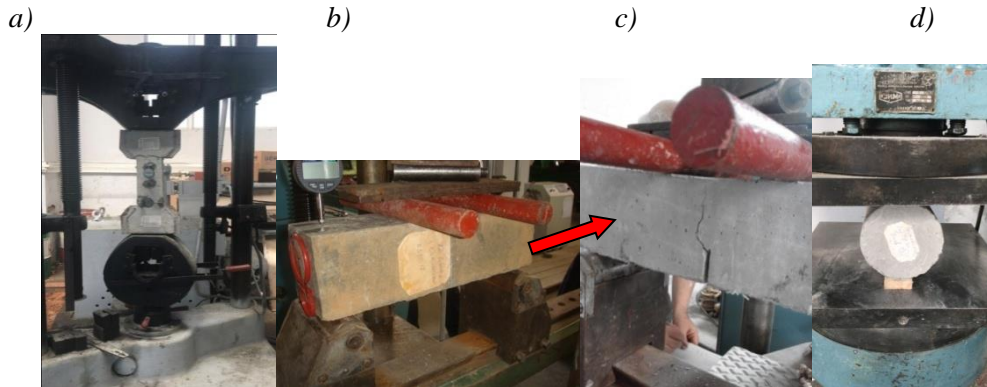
Fiber concrete tests: tension (*a*), bend (*b*), crack strength (*c*) and splitting test (*d*)
